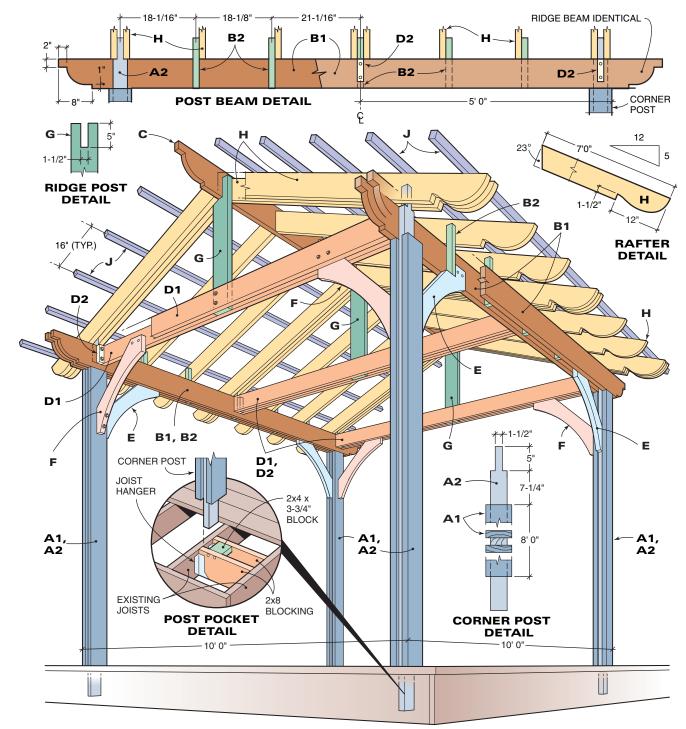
FIG. A SHADING STRUCTURE DETAILS (See p. 48 for dimensions)
